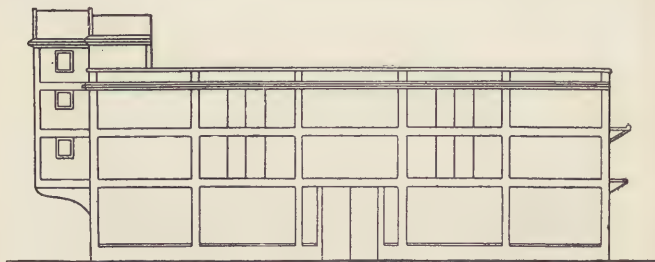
Manchester Dock Transit Sheds (East Elevation).
